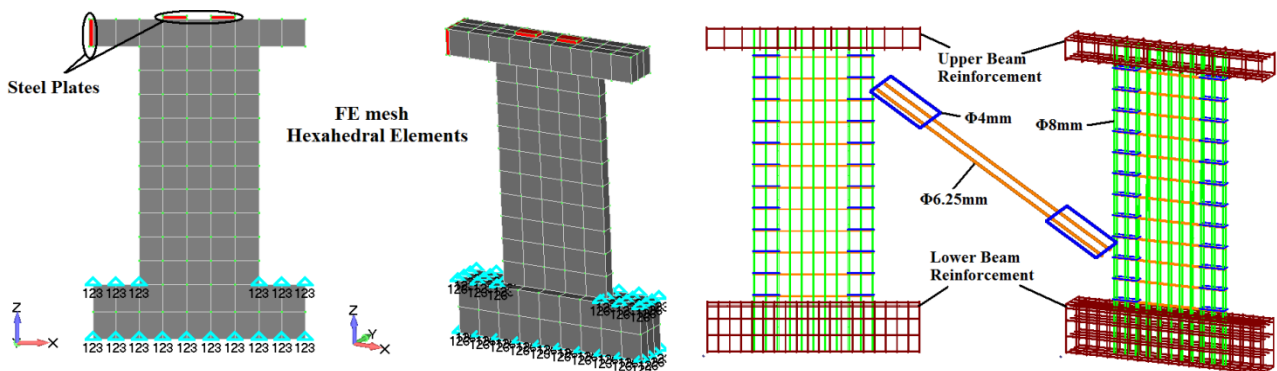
TYPE II RC SHEAR WALL. FE MESH.
